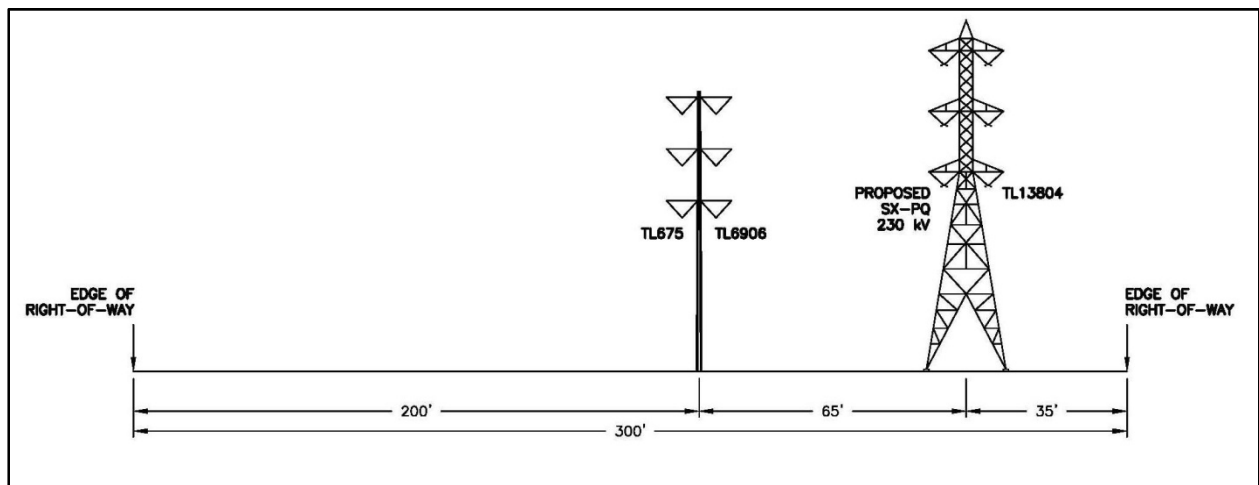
Segment D Proposed ROW Cross Section (View West)
